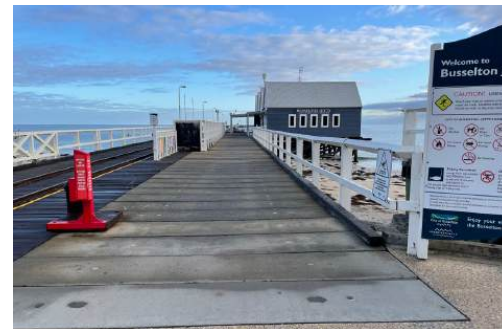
View of concrete deck at Jetty Section 1- East. *H+H Architects, 2022.
